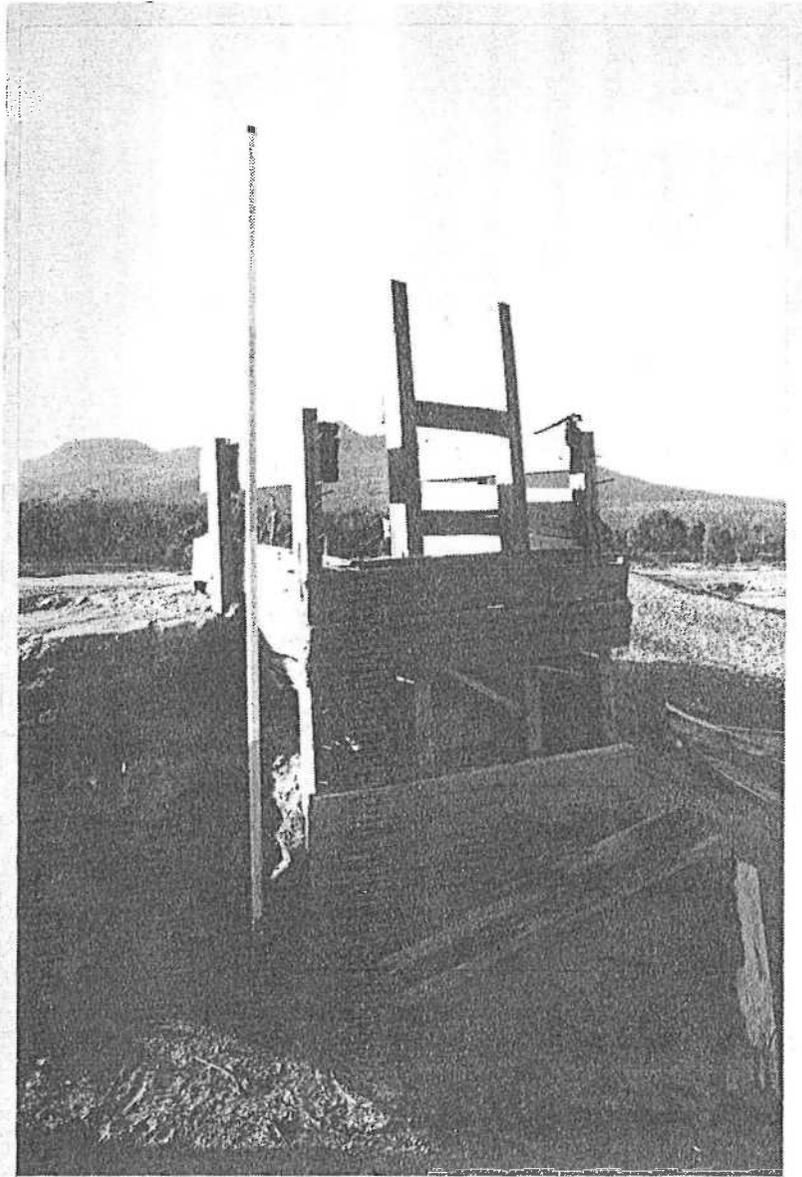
Feature 9, silt -trap in southeast corner of slime dam #5.
